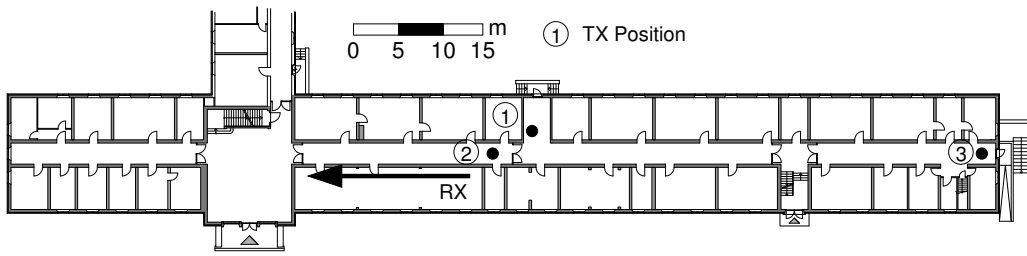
Floorplan of building where indoor shadowing measurements were taken
